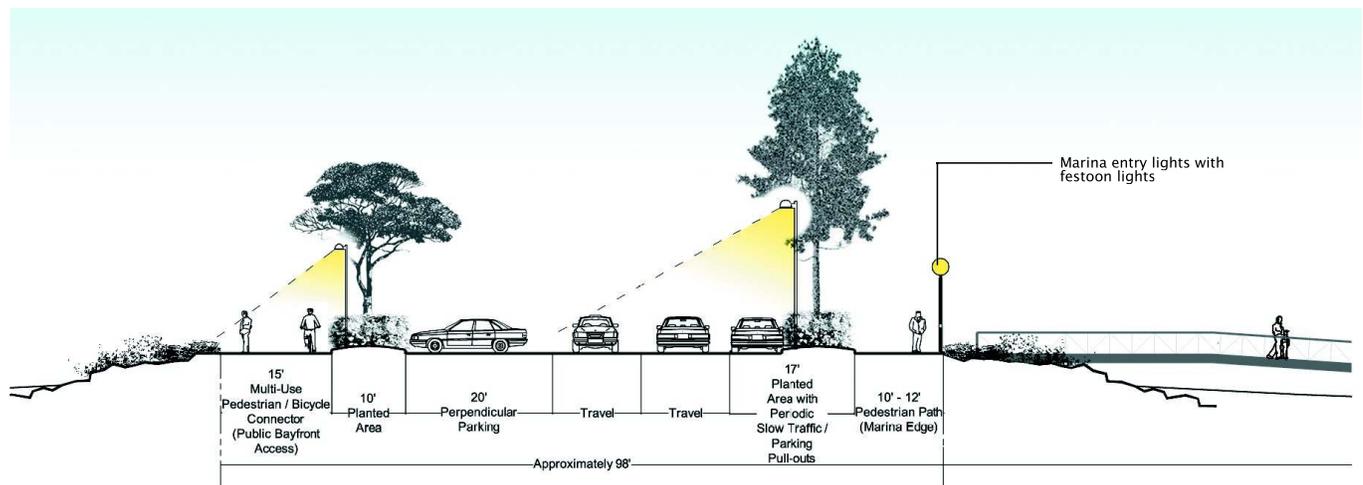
Spinnaker Point Drive (South Dike Road) - prototypical cross section, looking west
